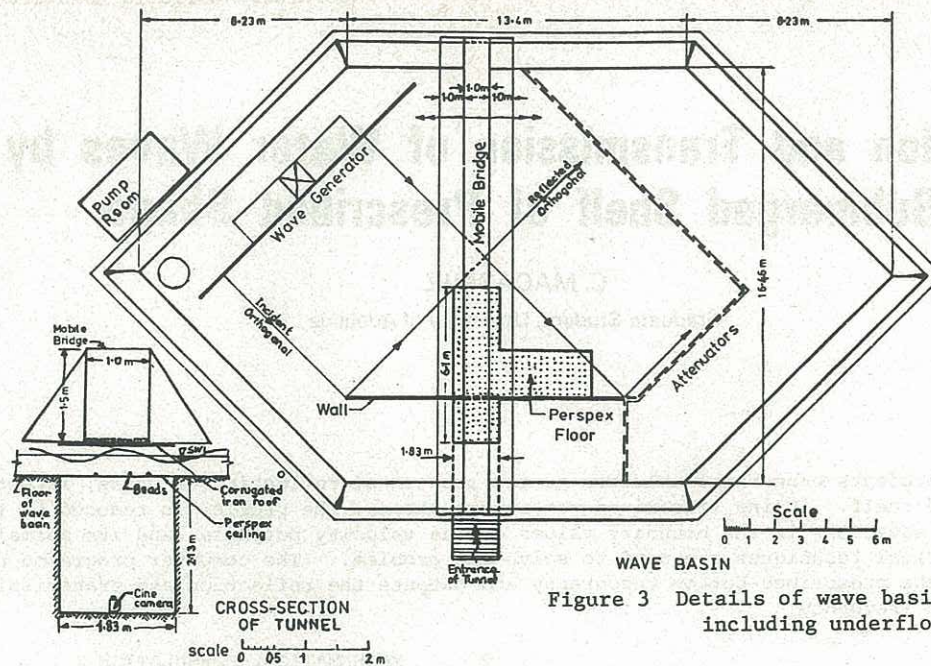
Details of wave basin and appurtenances, including underfloor tunnel
